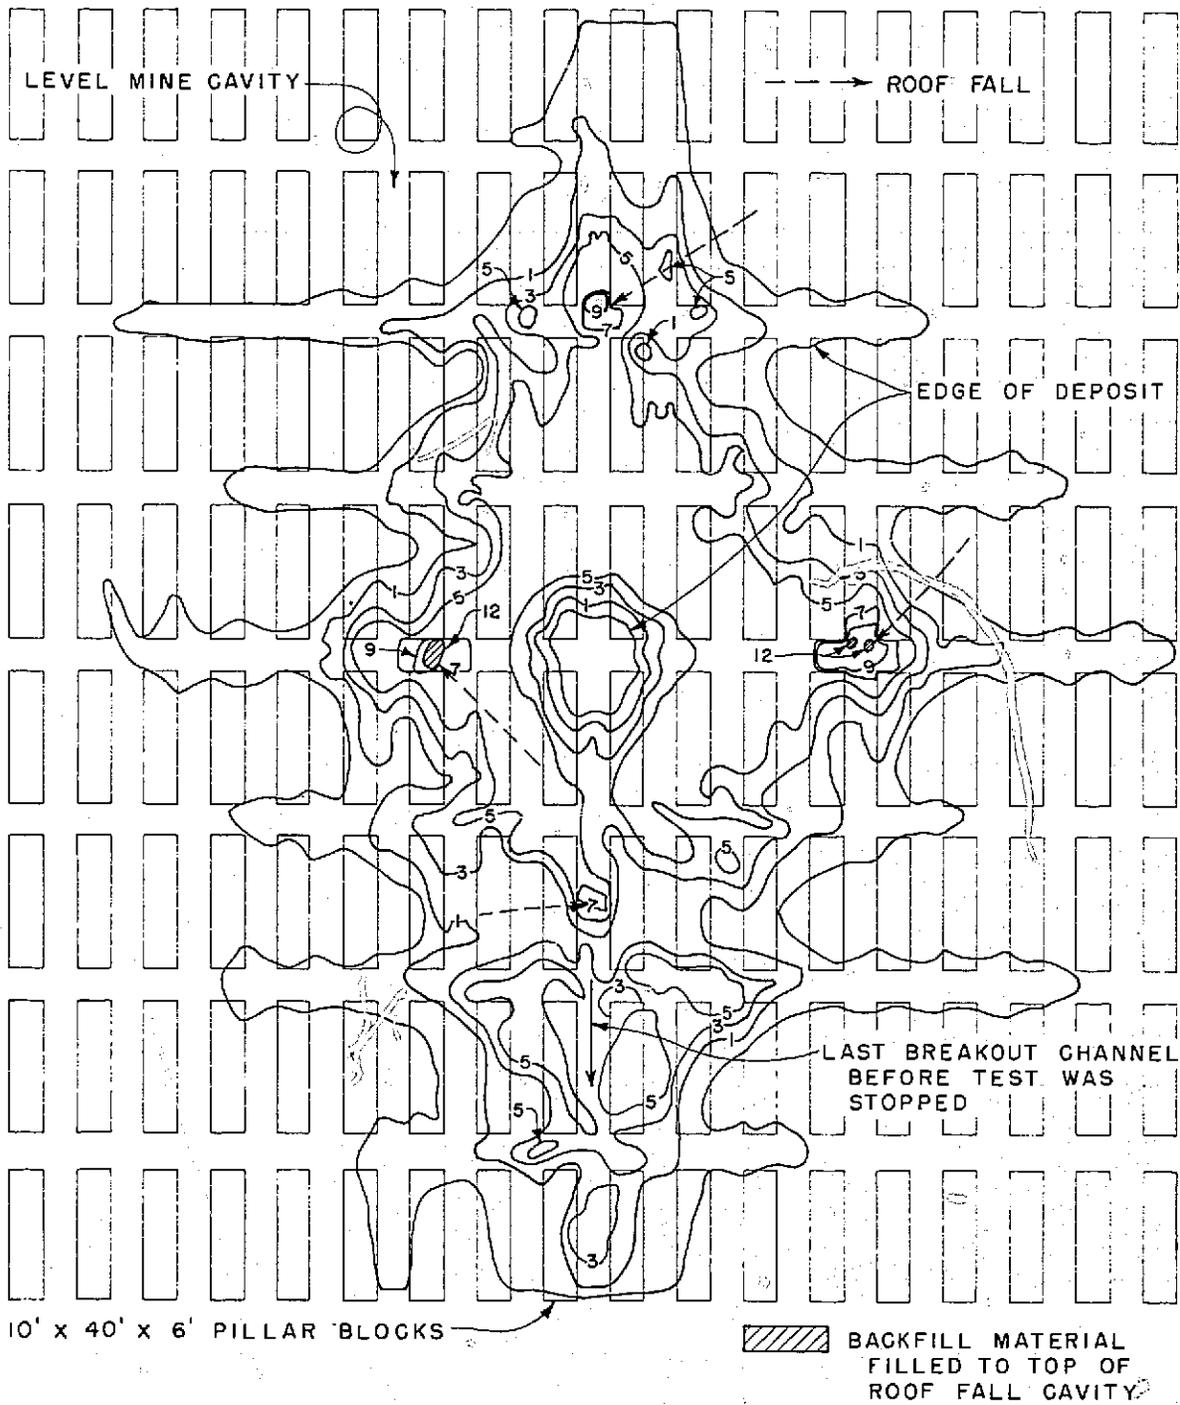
Test 17. Contours of deposit pattern at the end of the test. Last breakout channel flowed over a roof fall.
